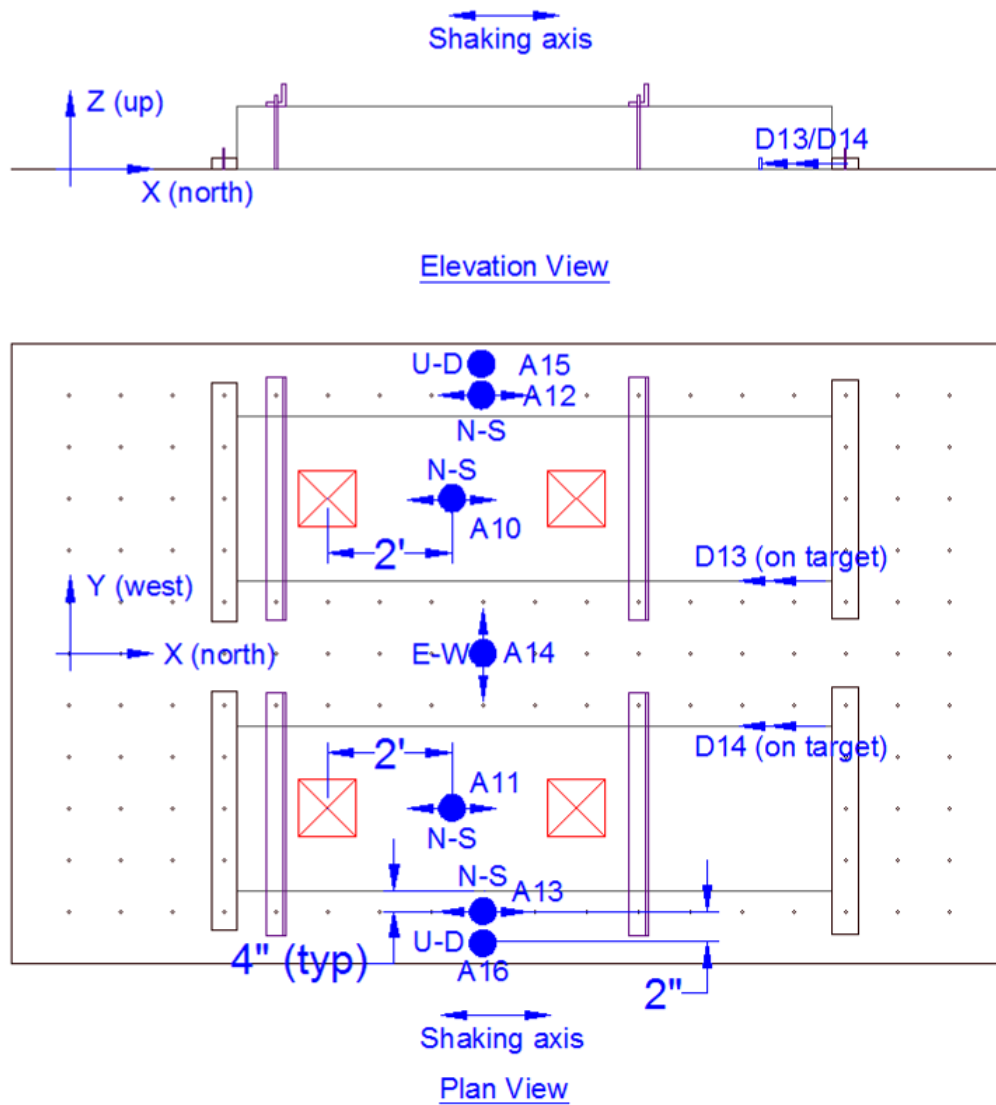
Foundation/shake table instrumentation, elevation (top) and plan (bottom)
